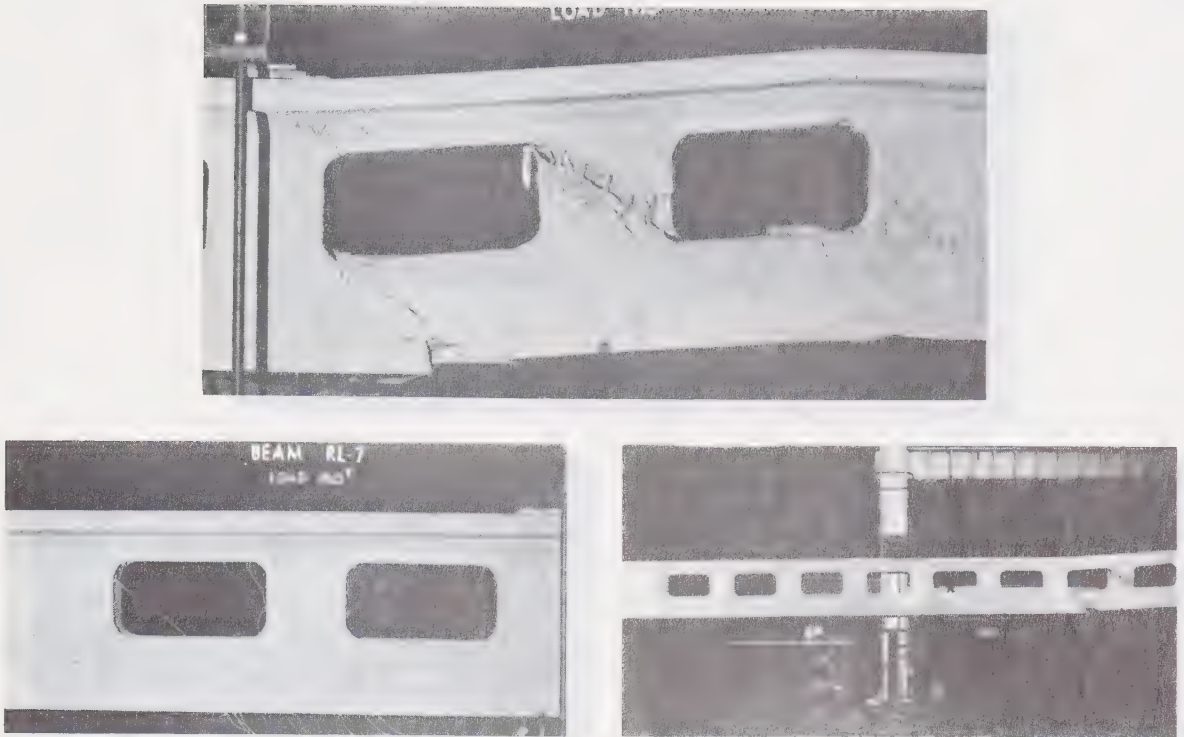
CRACKING AND FAILURE PATTERN OF BEAM 7-16-6
